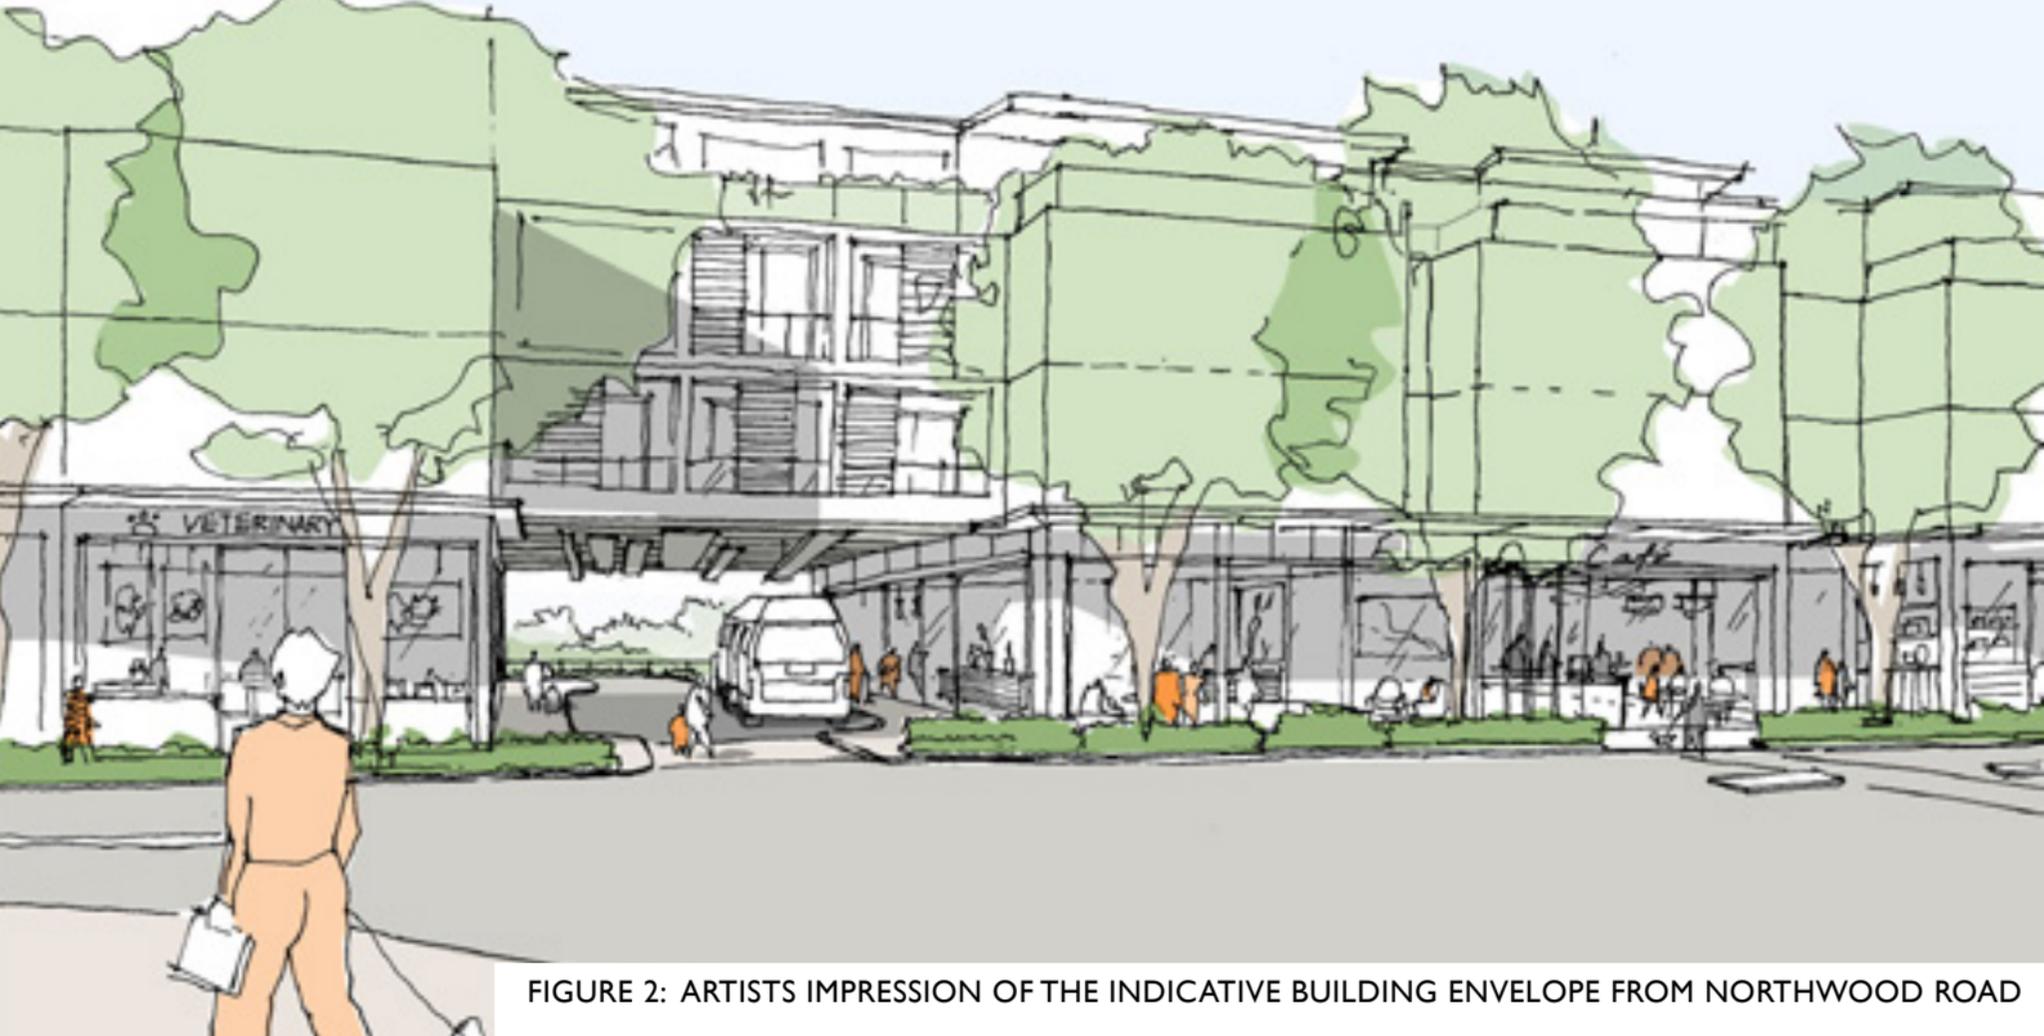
ARTISTS IMPRESSION OF THE INDICATIVE BUILDING ENVELOPE FROM NORTHWOOD ROAD
